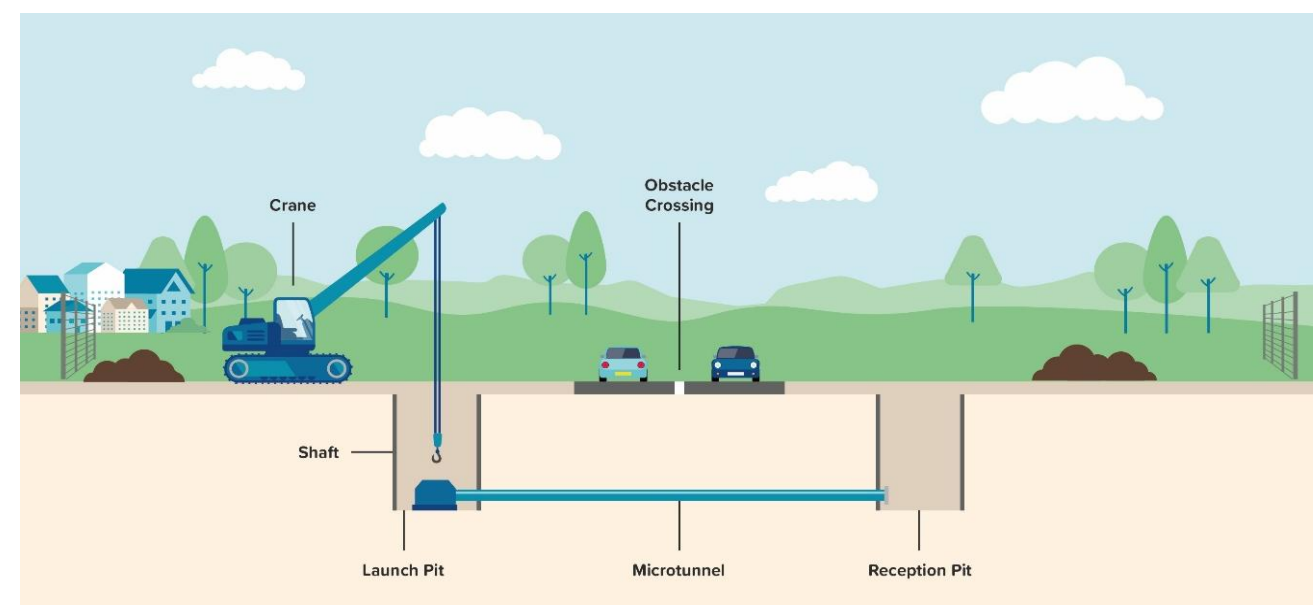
Indicative Cross-Section of Trenchless Duct Installation (Note: Arrangement dependent on the selected trenchless installation technique at each crossing, alternative techniques to HDD such as micro-tunnelling or pipe-jacking are also considered)
